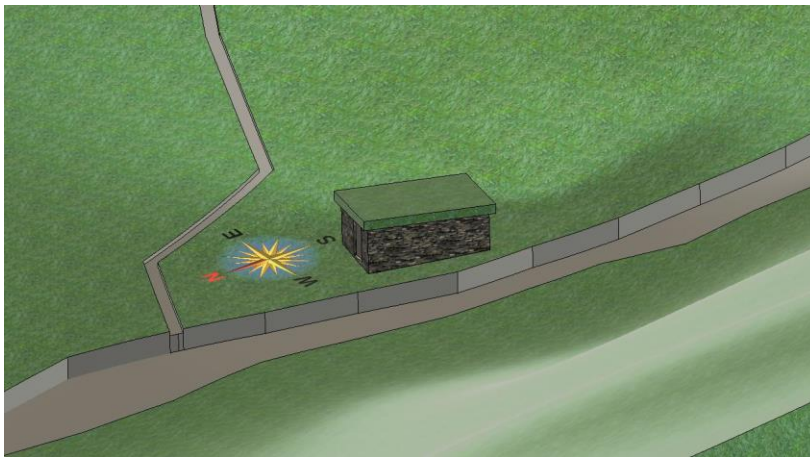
Turbine hut appearance. Wall dimensions (external) 4.6 m long × 2.8 m wide. Internal height (floor-ceiling) 1.52 – 1.66 m; roof overhang 20 cm. Stone walls with turf roof.
